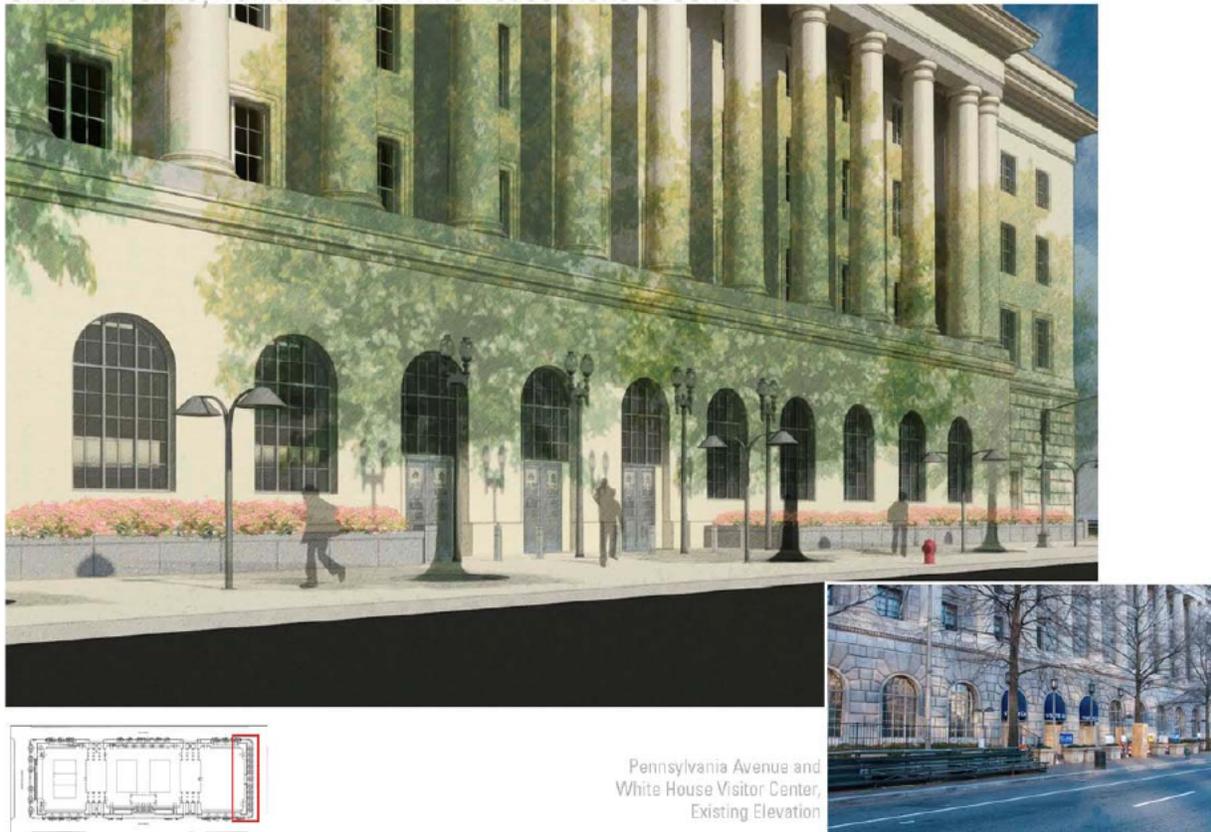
Pennsylvania Avenue – White House Visitor's Center Entrance
